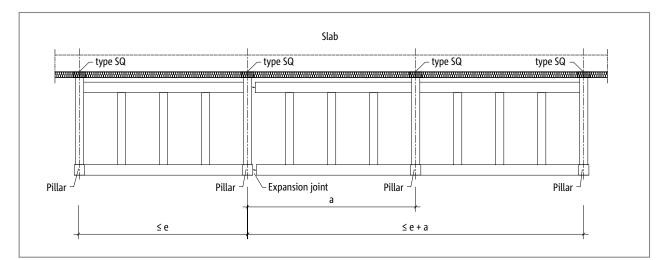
Schöck Isokorb® T type SQ: Maximum expansion joint spacing e and lateral overhang a
